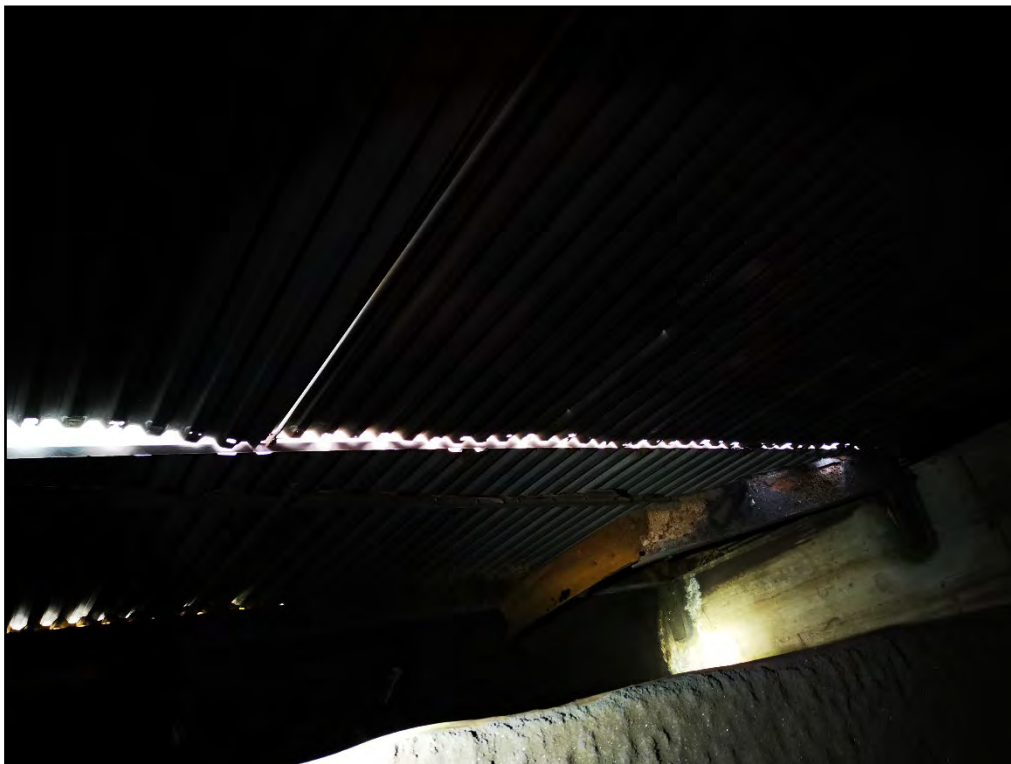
Surface Corrosion of Purlin, Column, Beam and Bracing with Bolt Connection
